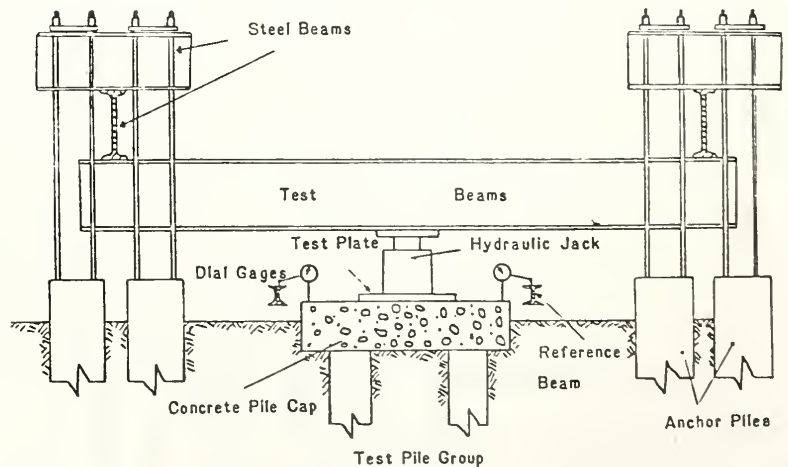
Typical Arrangement For Applying Load Test To Pile Group ( ASTM, 1981 )
